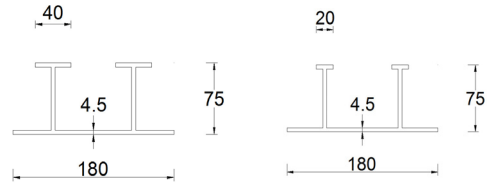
FRP Shape of Top Flange Width 20 and 40(mm)
